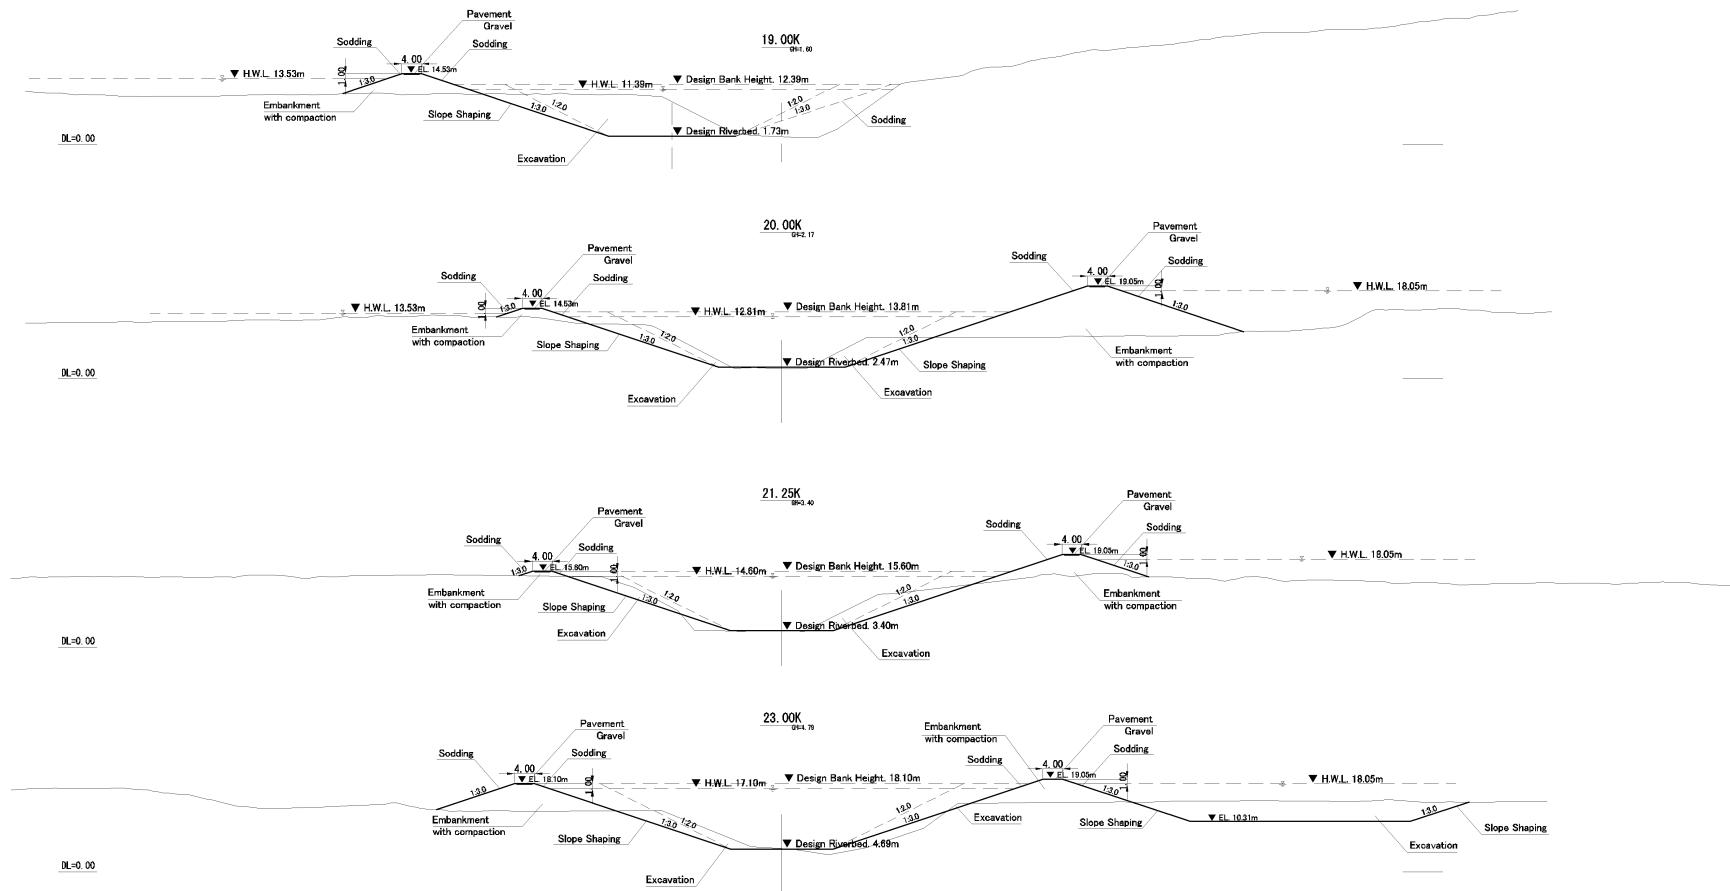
Typical Cross Section (Retarding Basin A,B)
